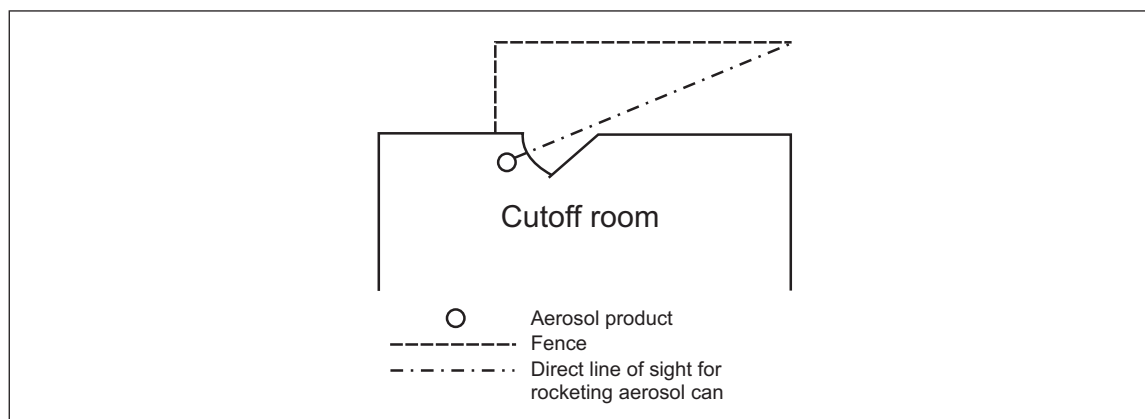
Example of a labyrinth opening arrangement for a cutoff room opening.
